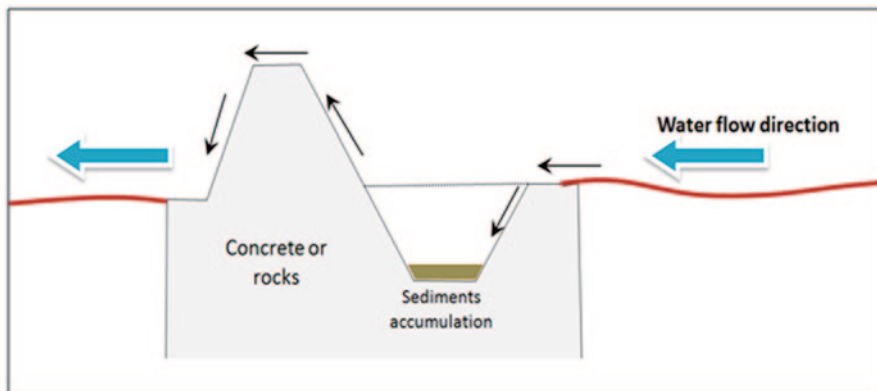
Example showing a cross-section of a proposed Check Dam
